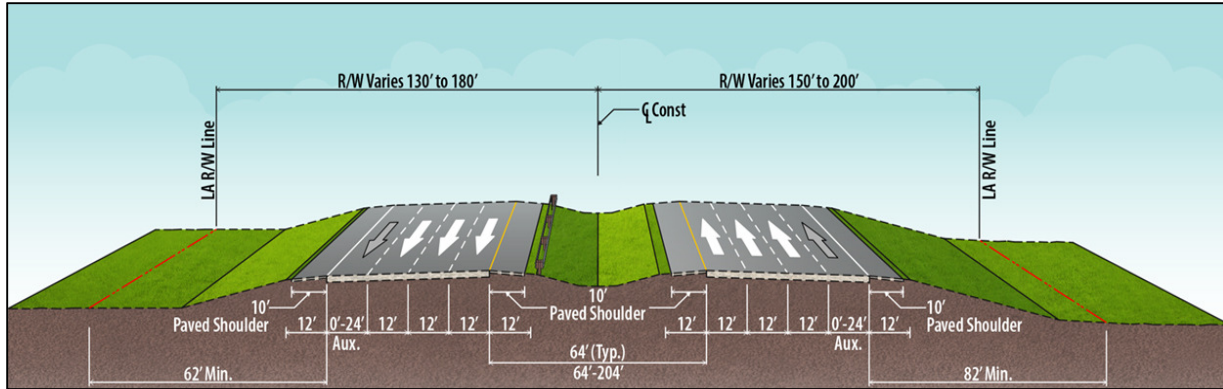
Existing I-275 Mainline Typical Section from south of Gandy Boulevard to Roosevelt Boulevard (Segment C-1)
